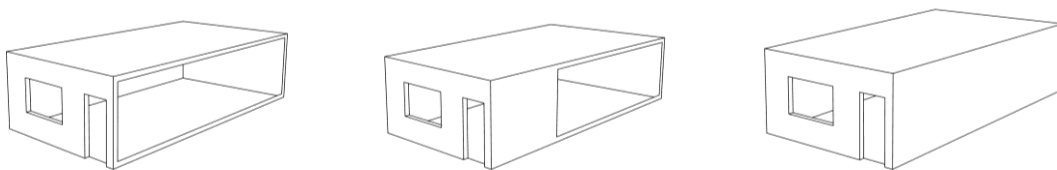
Construction panel system types (left to right) small, large, cross wall panels drawn by the author using (Staib et al., 2008)
